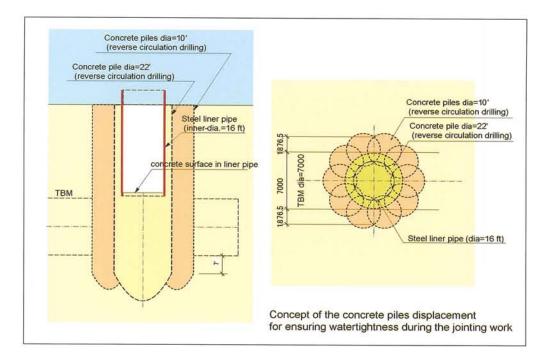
Once the secant piles were set, a shaft was to be excavated and lined with steel to allow intake riser placement.
